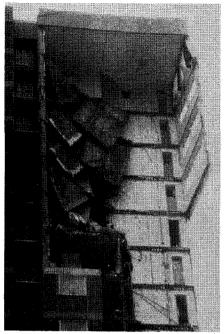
Closeup of damage at top portion of Ronan Point Apartment Building (Reference 1).
